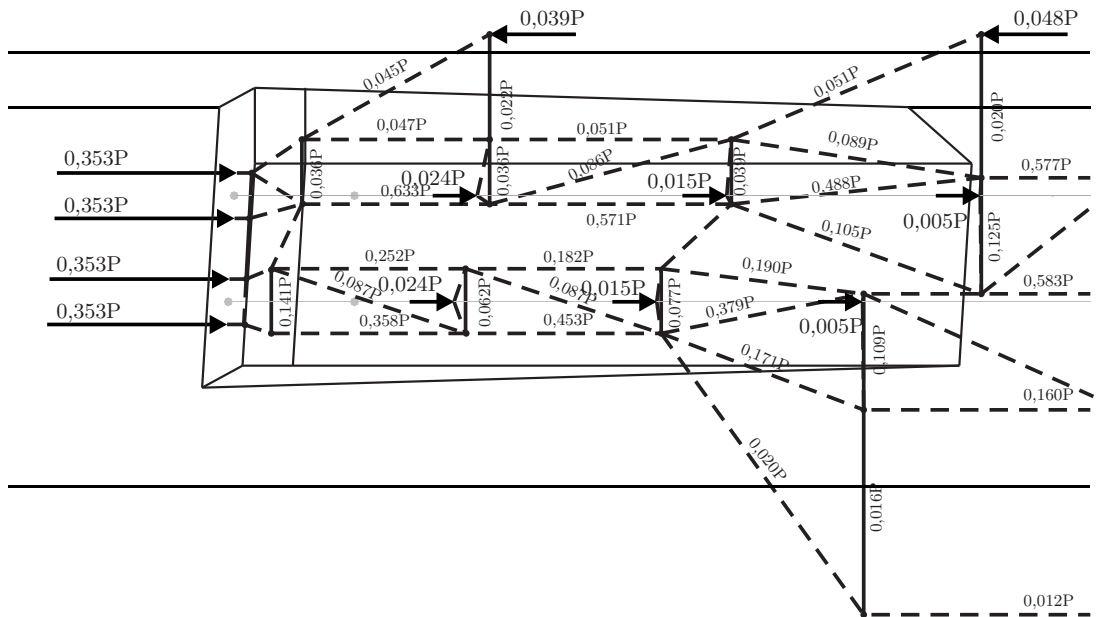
Strut and tie model - Top plan view (detail of the anchorage zone)
